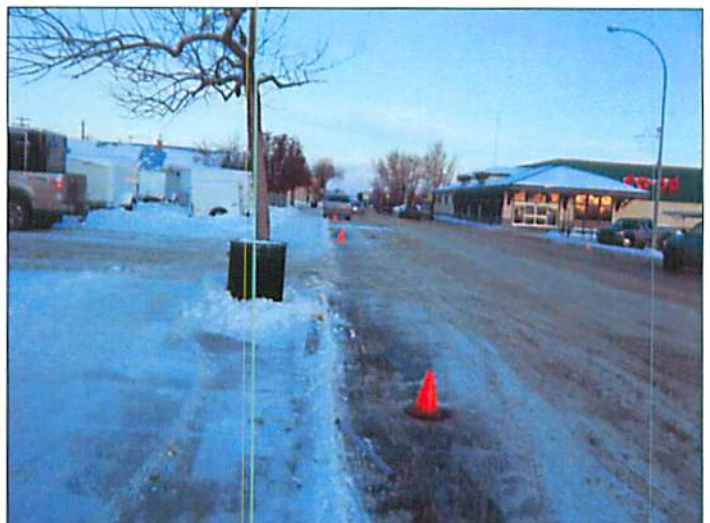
View of wells located on 10<sup>th</sup> Avenue.
